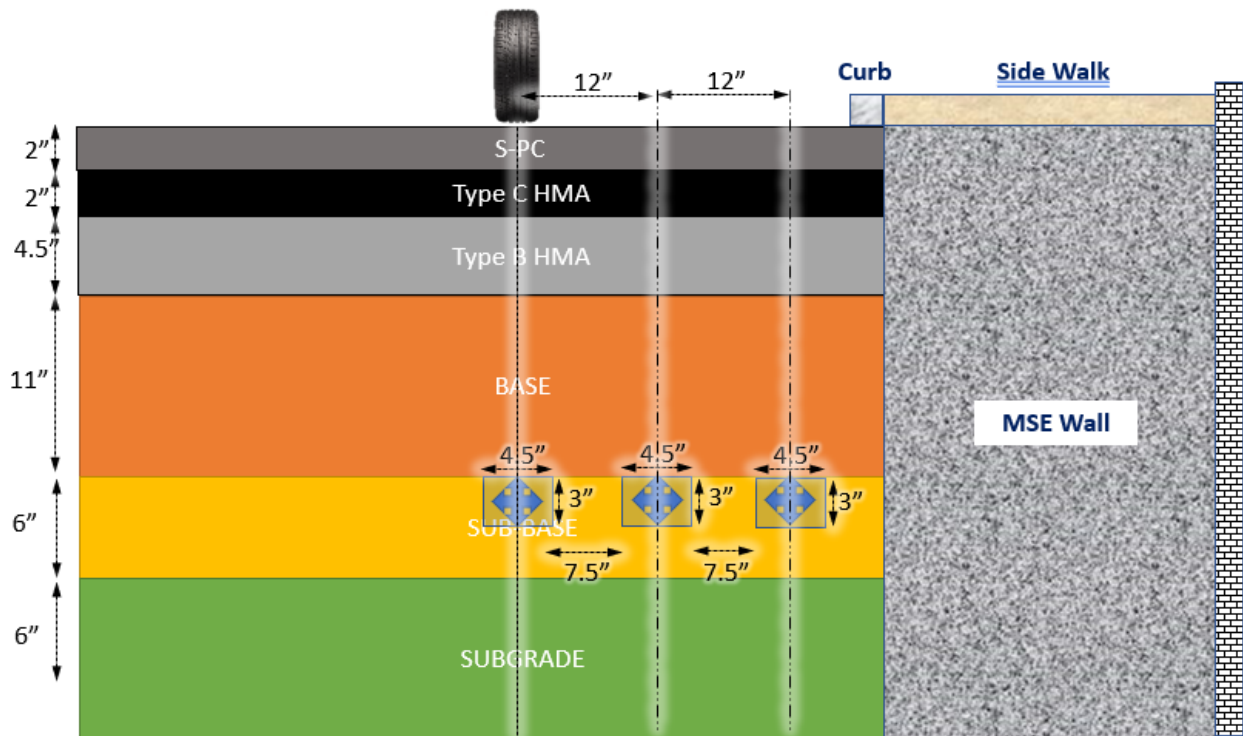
Cross section view at location offset -1' in sections 1b, 2, 3 & 4
